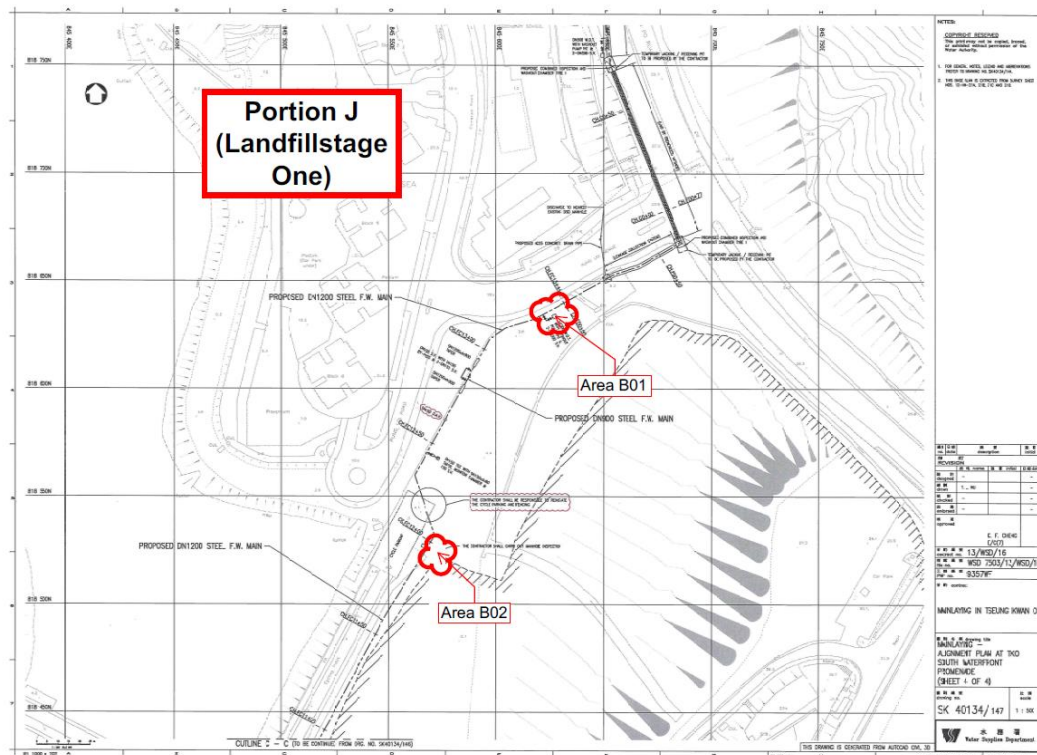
Location Plan – Landfill Stage 1 (Area B01-B02)
